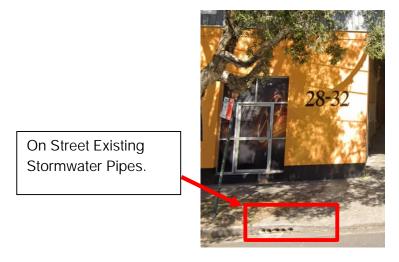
Stormwater Pipe Discharge (28-32 Bourke Road)
